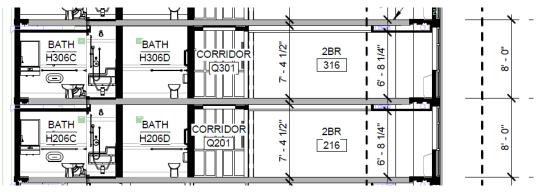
Floor Composition Detail | Courtesy of Ameripod Website
